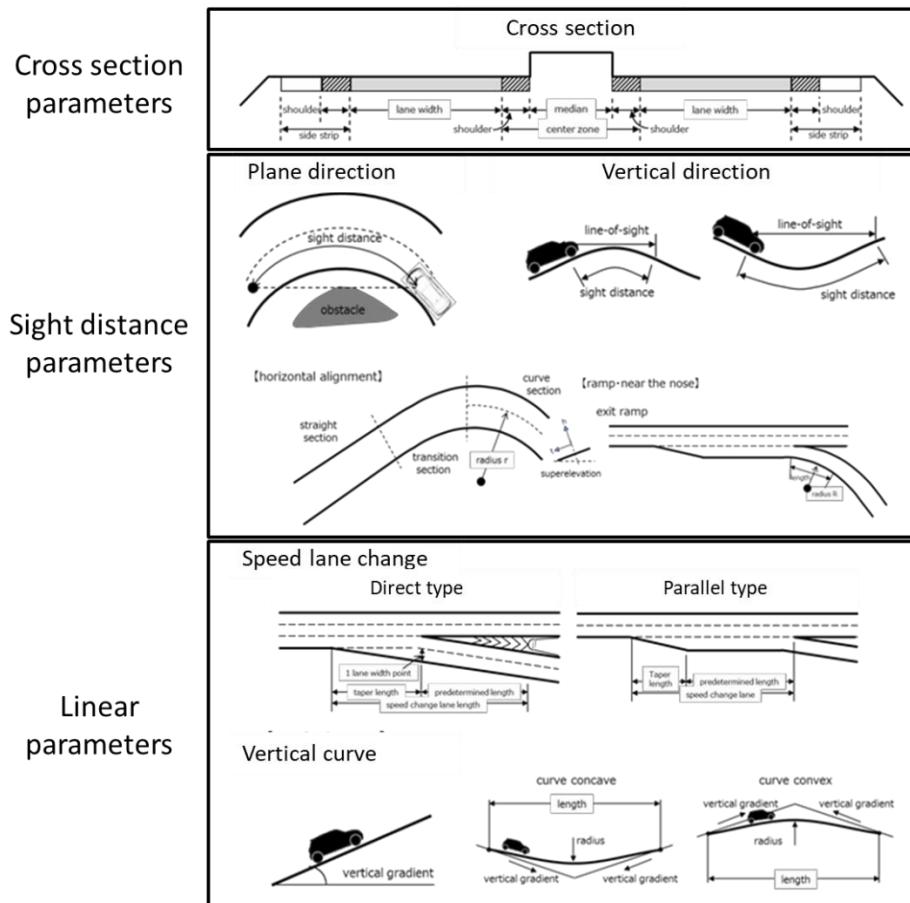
An example of cross-sections, viewing distance, and linear road parameters based on the Japanese Cabinet Order on Road Structure.
